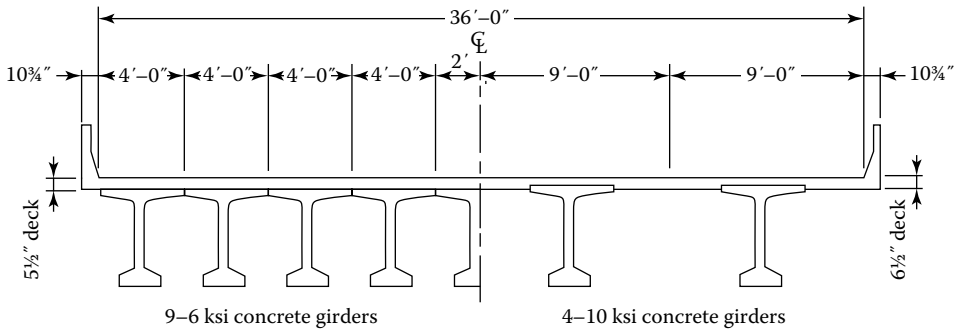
Two 150 ft simple-span bridge designs with different concrete strengths. (From Jobse, H.J., Application of high-strength concrete for highway bridges. Adapted from Executive summary, Publication No. FHWA/RD-87/079, Federal Highway Administration, Washington, DC, October 1987.)
